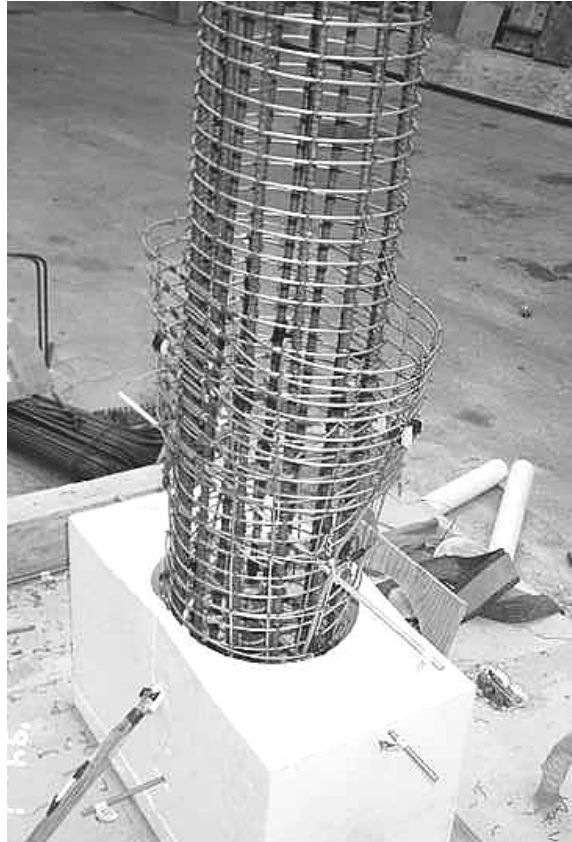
Column and Flare Reinforcement Encased in Foam Forms
